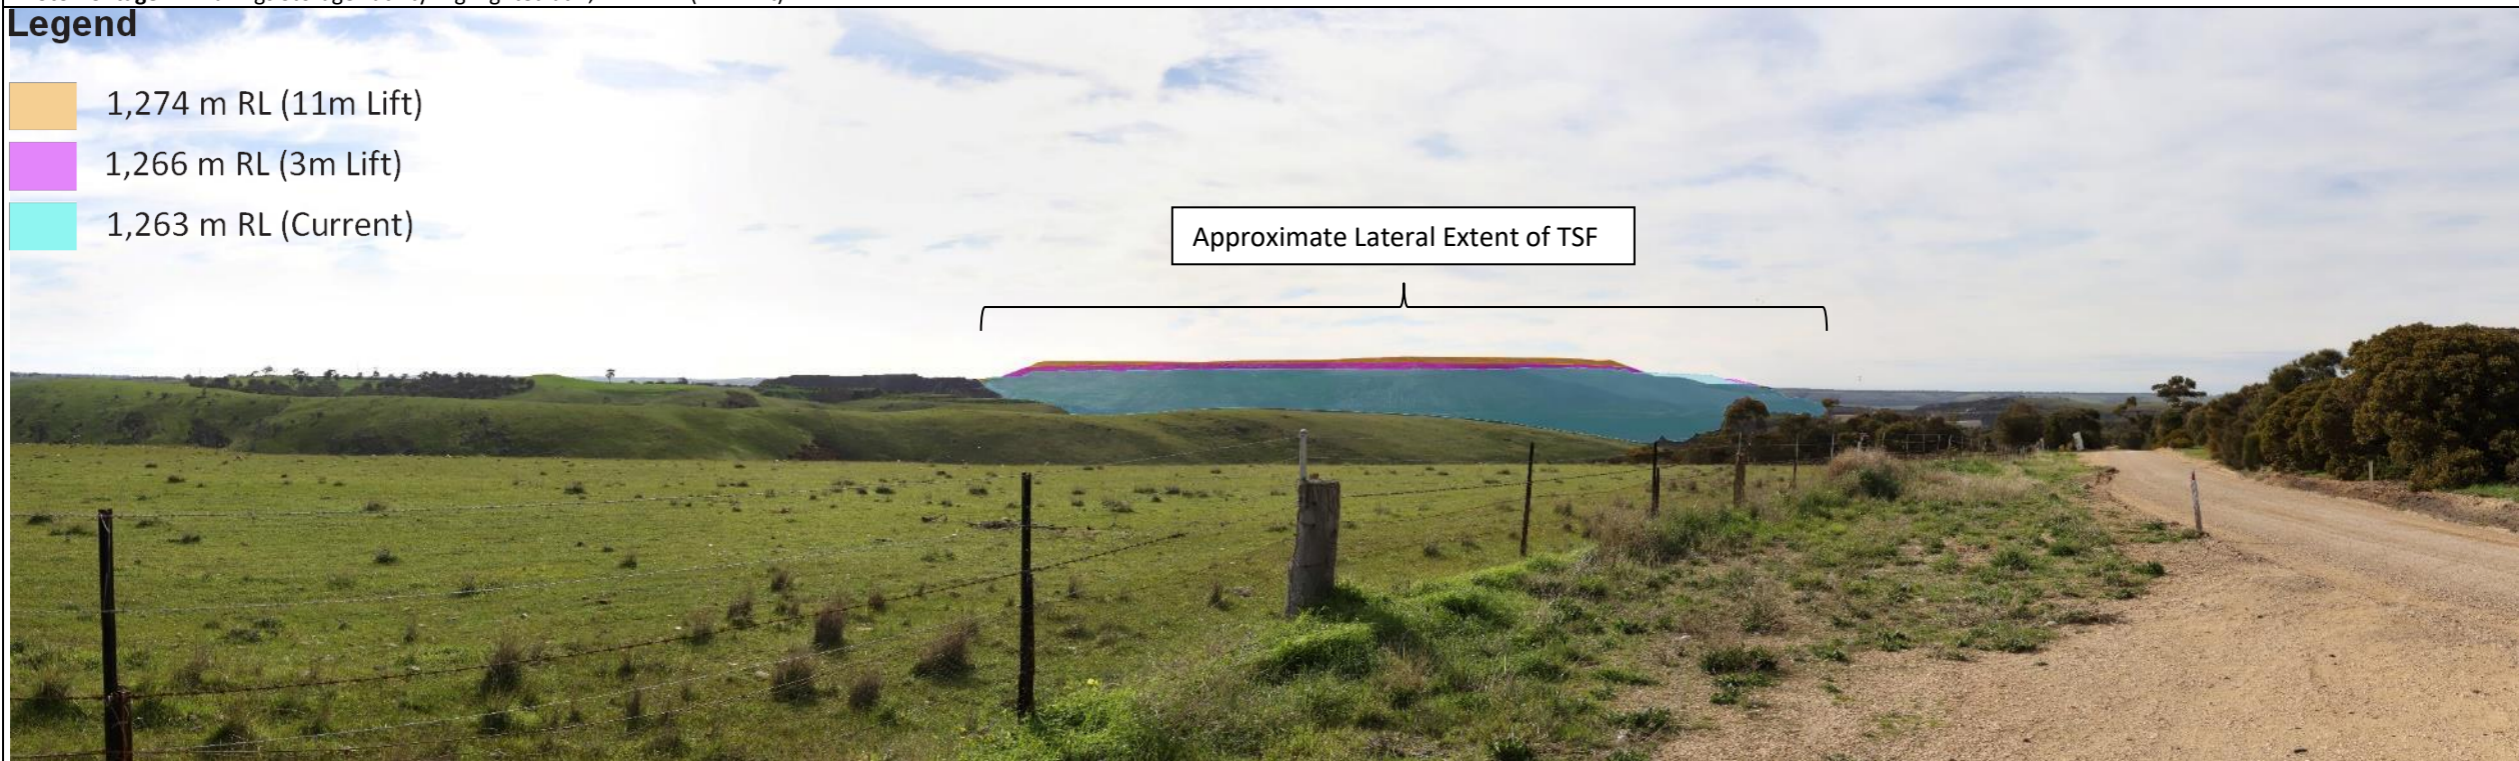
A: Tailings Storage Facility at 1,274 m RL (11m Lift)
